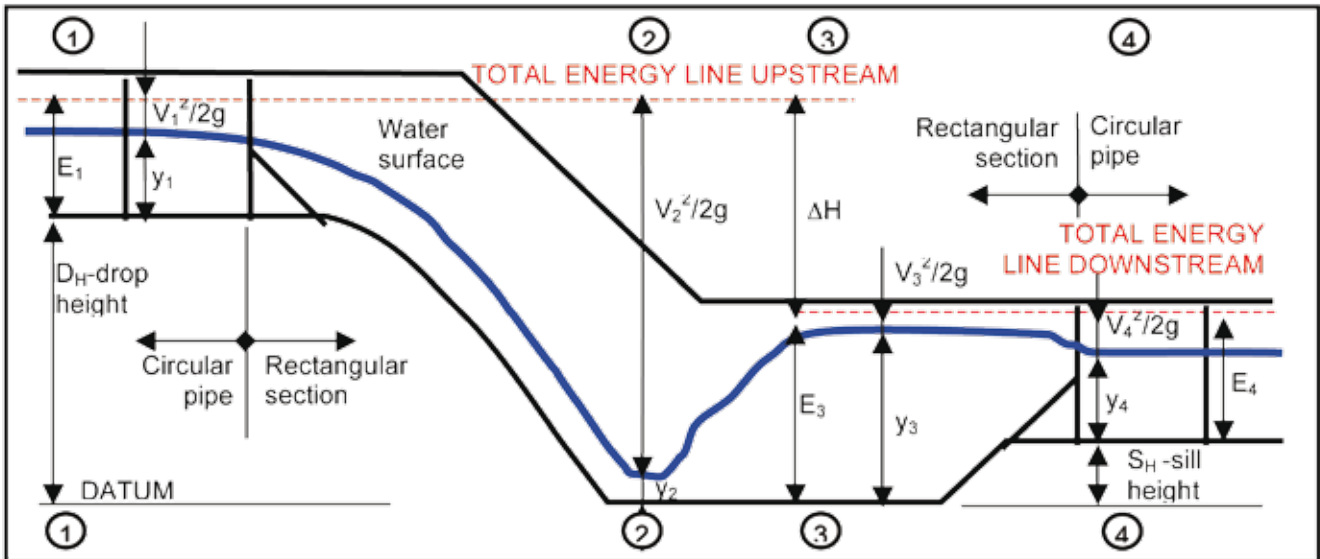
TYPICAL SECTION OF DROP STRUCTURE
